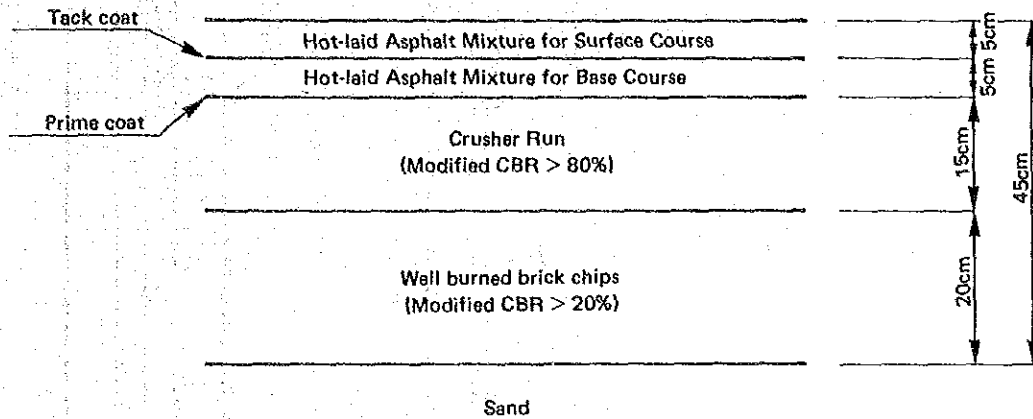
Sectional Paving Structure of Roads Within the Port Area
